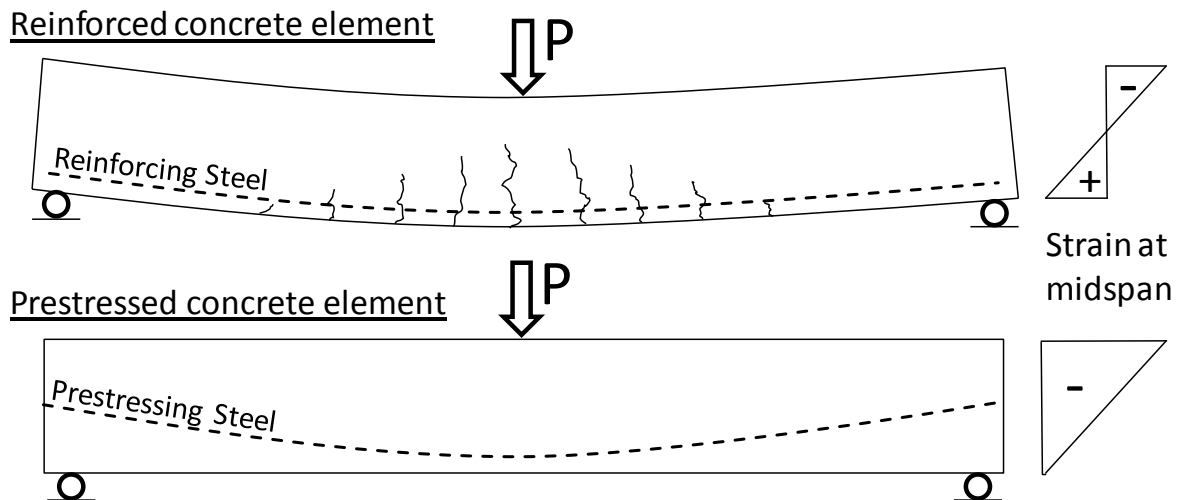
1. Influence of prestressing reinforcement on the behavior of a concrete element
